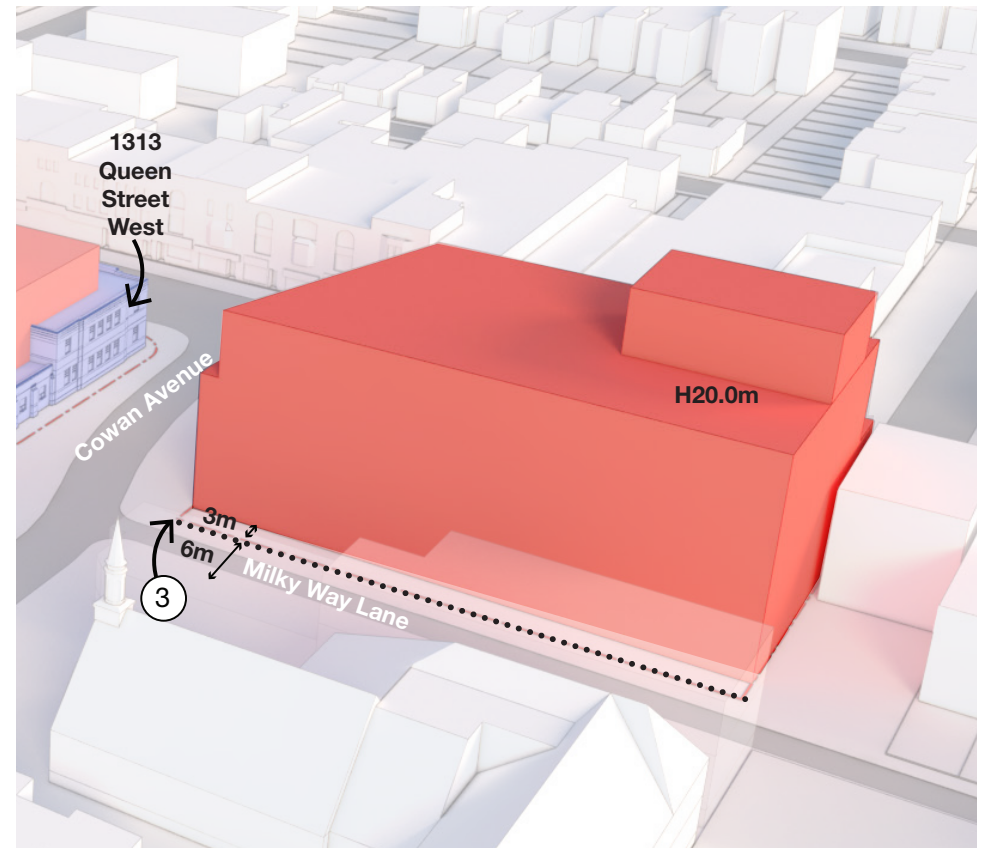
/ East Block massing model: rear view (looking towards Queen Street West).
